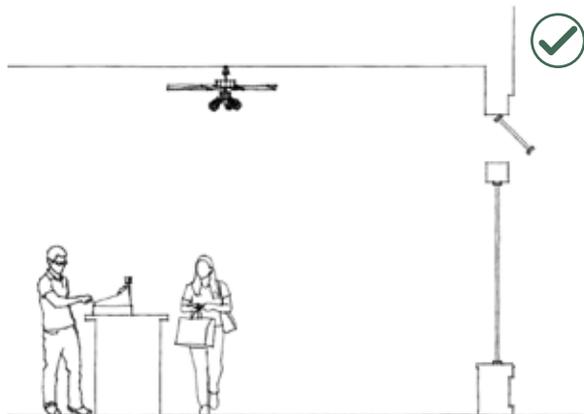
Operable storefront window transoms provide ventilation in a context appropriate design.
